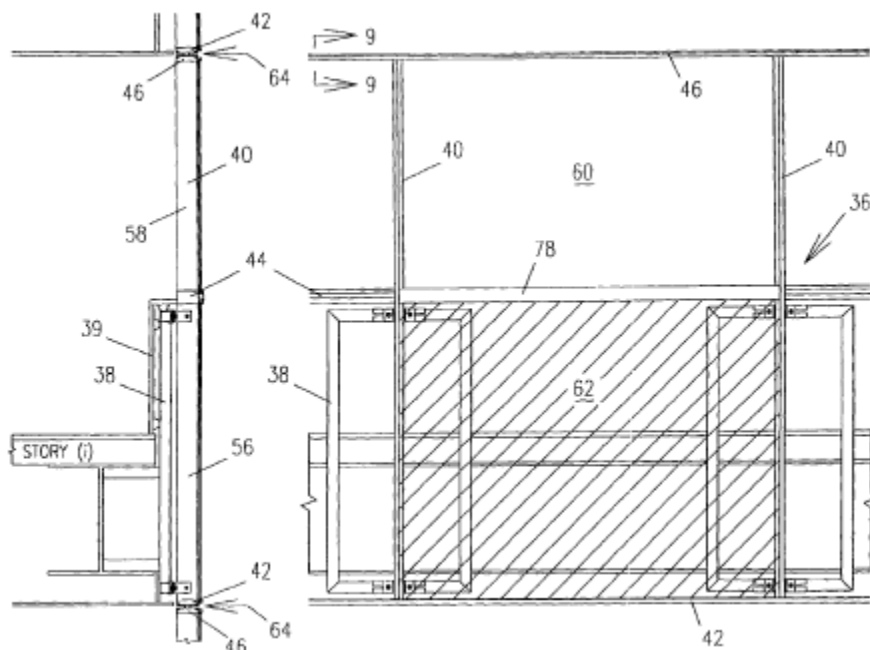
front elevation and side view of a portion of a panel frame of the curtain wall system according to the invention including vision panels and spandrel panels
